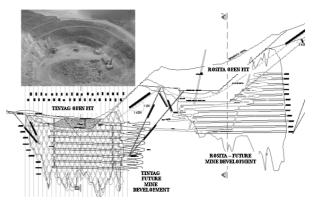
Longitudinal section of Tinyag and Rosita open pits and future underground development and picture of the Tinyag pit.
